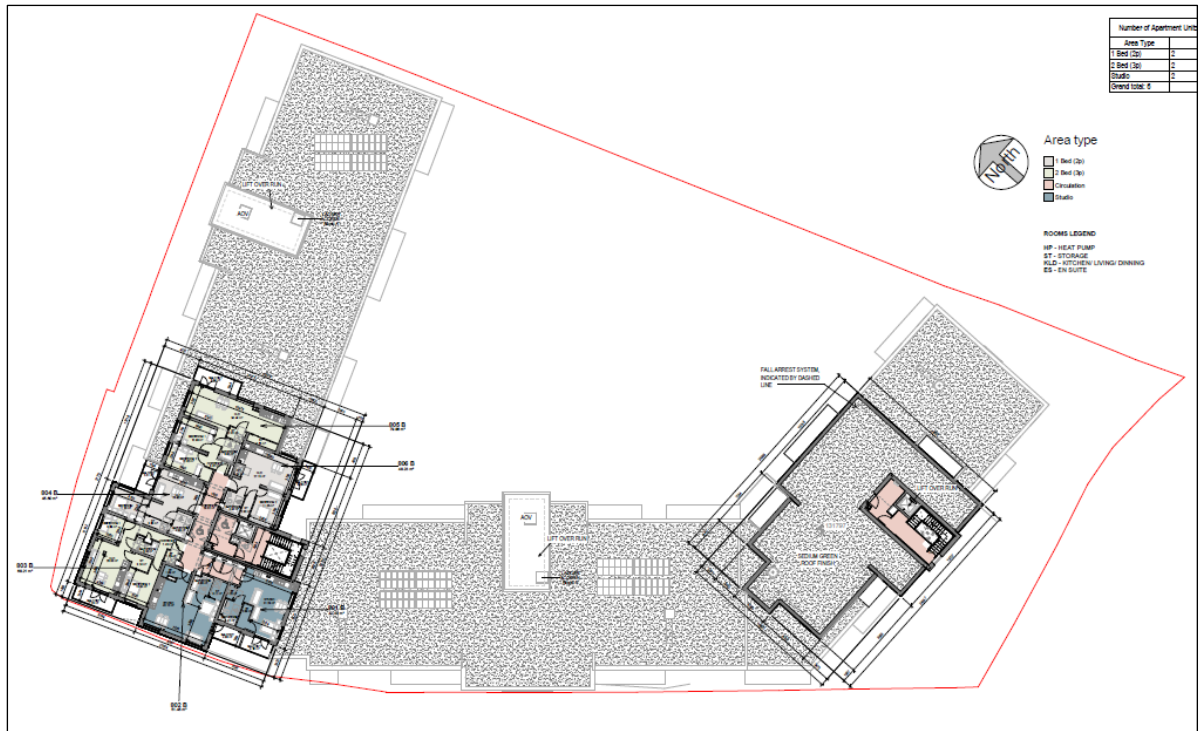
Eighth floor plan of proposed amended development under ABP Ref. ABP-307177-20
